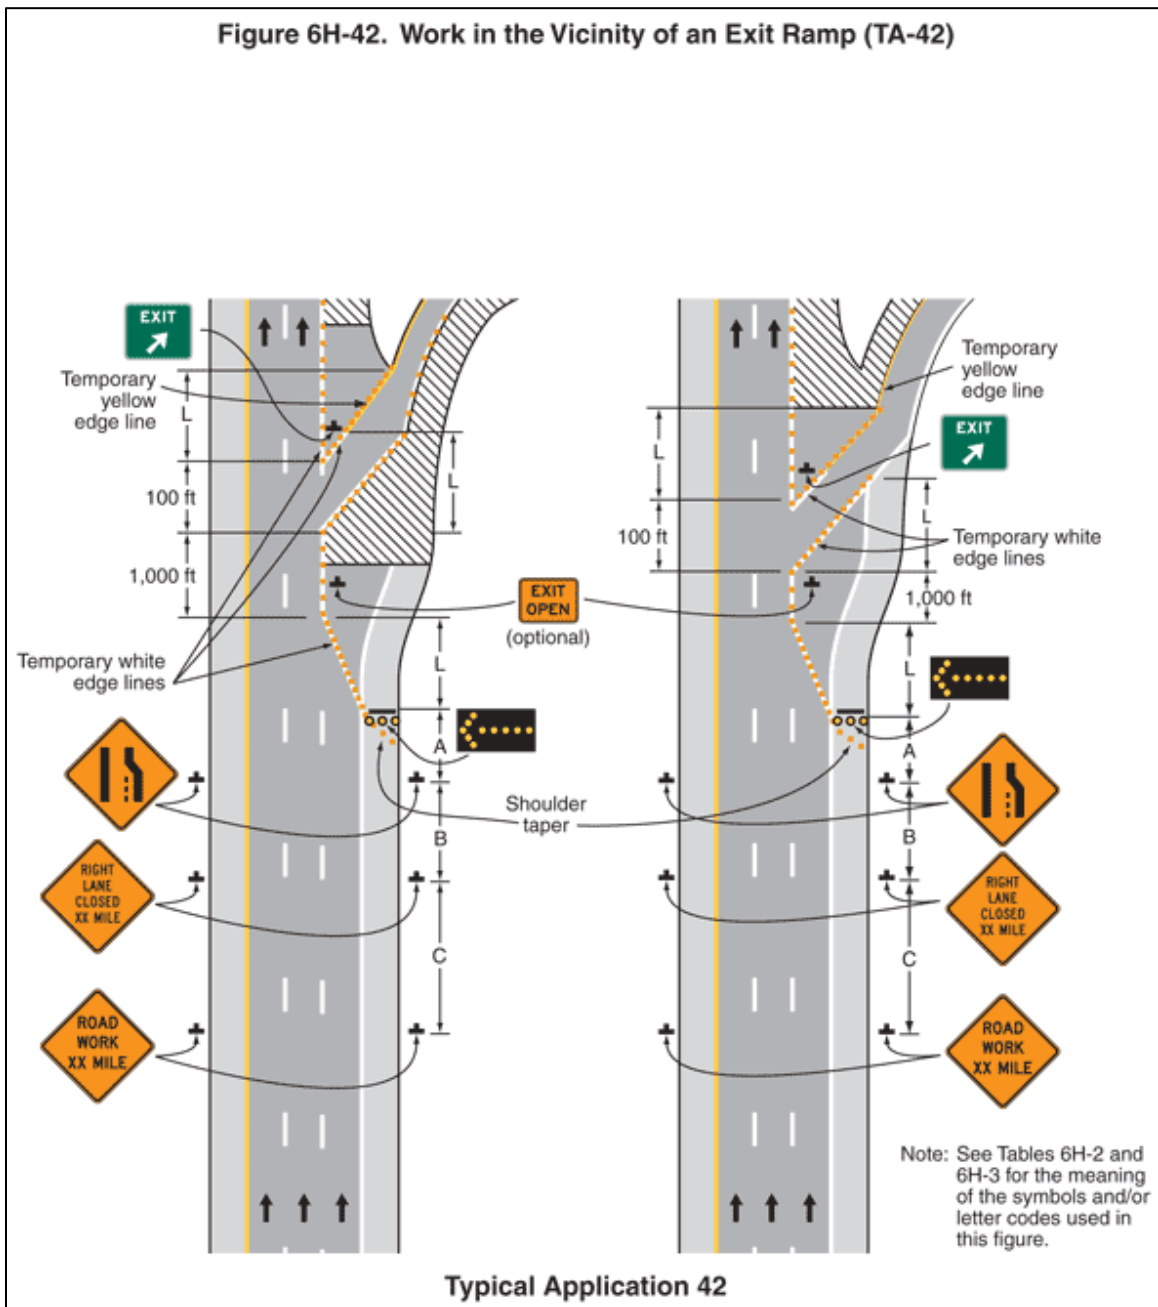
MUTCD Typical Application 6H-42 (FHWA, 2009)
